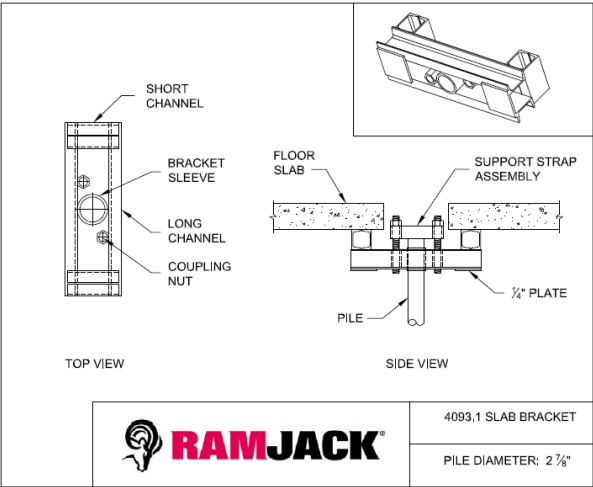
4093.1 FLOOR SLAB BRACKET AND PILING
